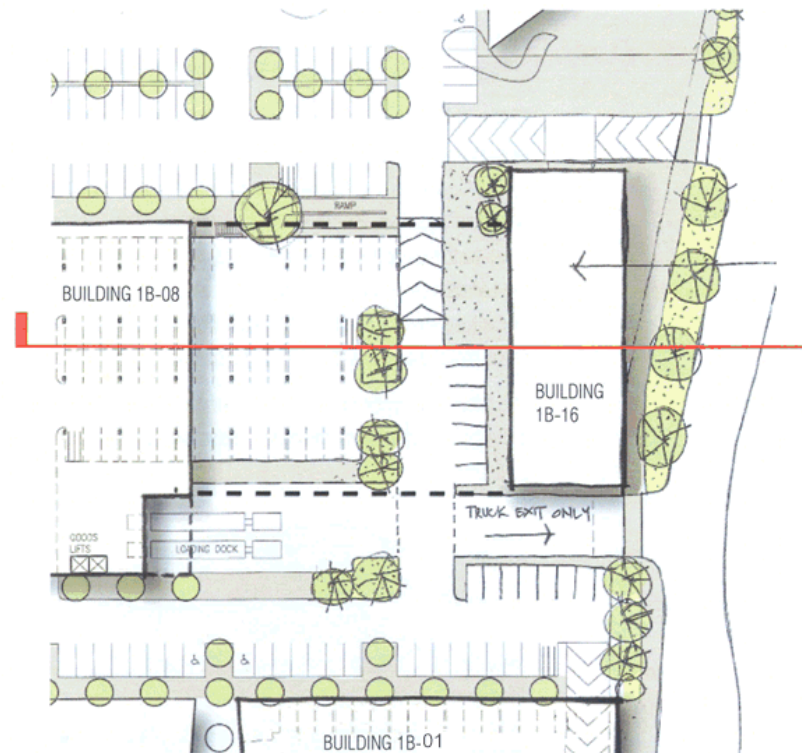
Indicative Part Plan of Precinct 1B (Source: HASSELL, 2008)
